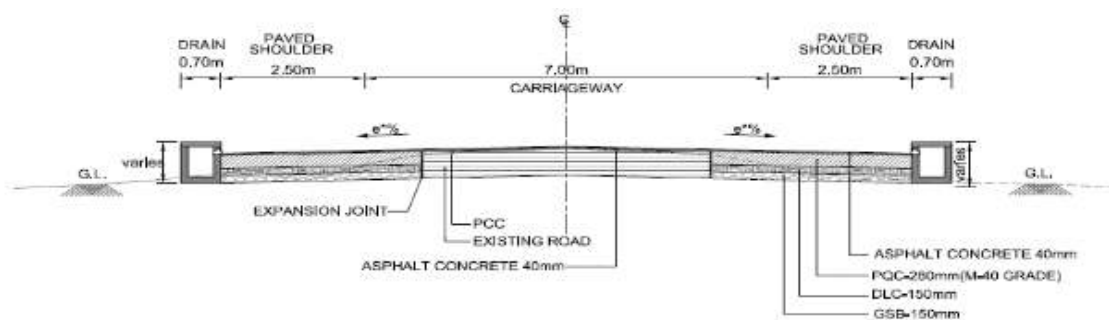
TCS-2.3 Built up Area 2-Lane Carriageway with Paved Shoulder (Concentric Widening)
